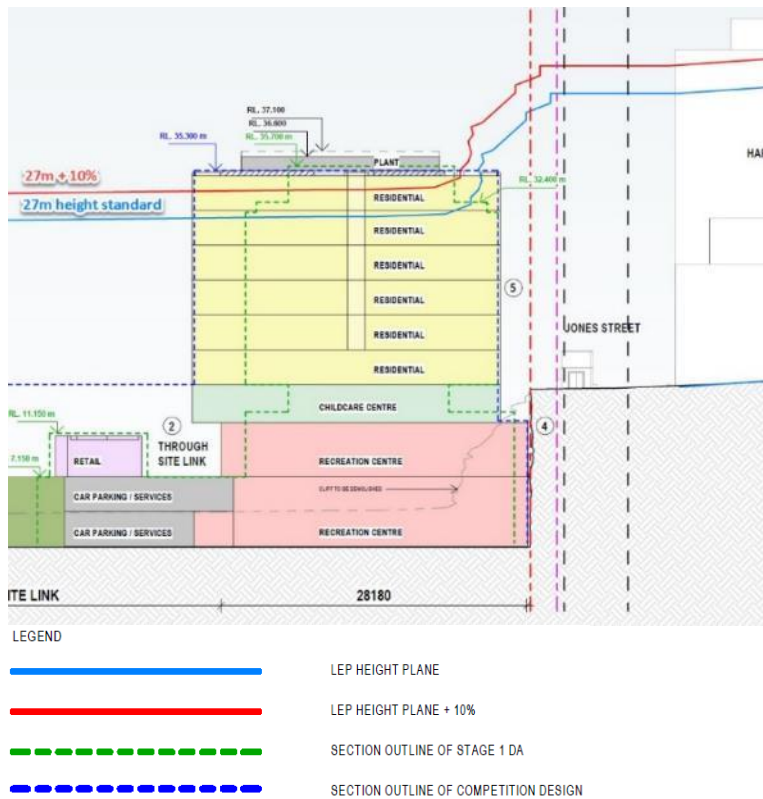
Building B - Jones Street Section: Proposed/modified building envelope
